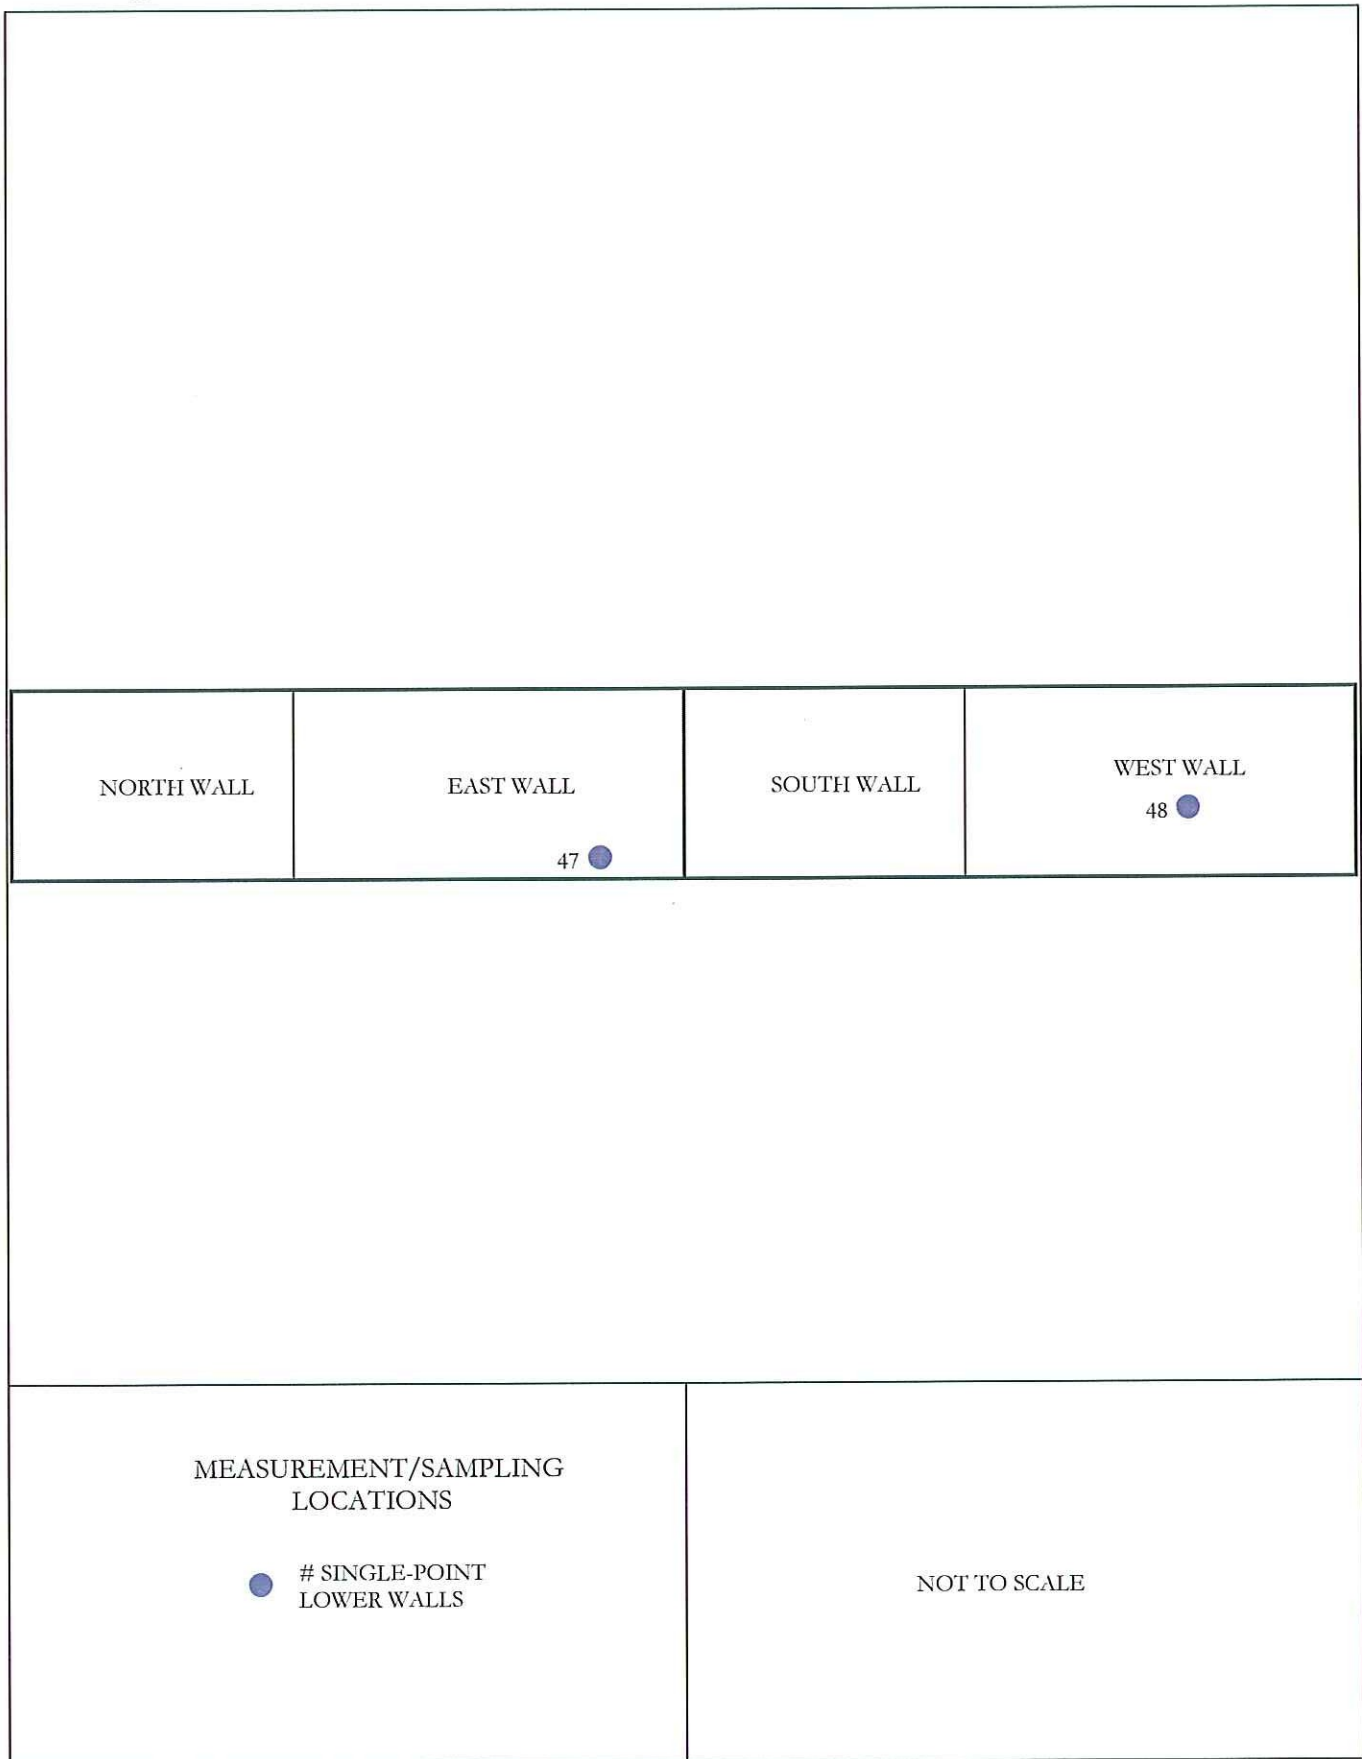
Waste Water Treatment Building - Measurement and Sampling Locations
